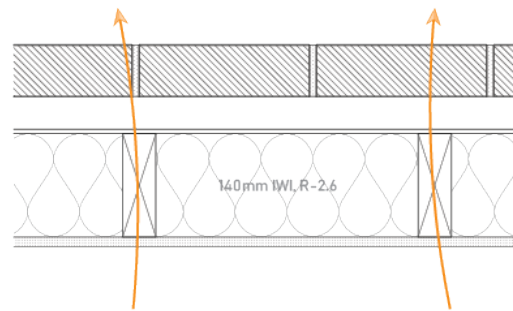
Geometrical wall (actual detail) that can be modelled in THERM
